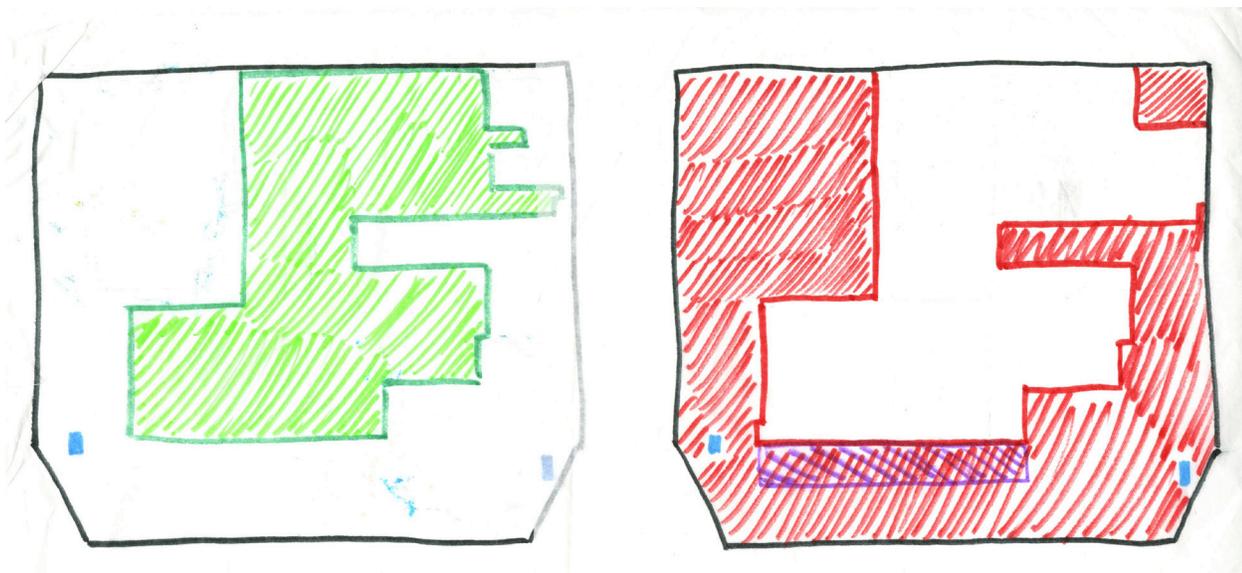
Trace paper sketch overlaid on P1 plan. Green is available space for intervention. Red is off-limits.
